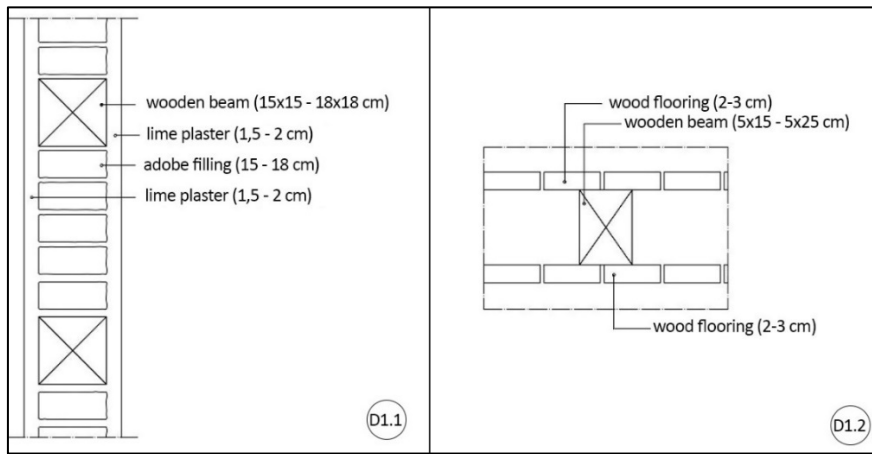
Wall and flooring details of the timber-framed house (produced by the authors)
